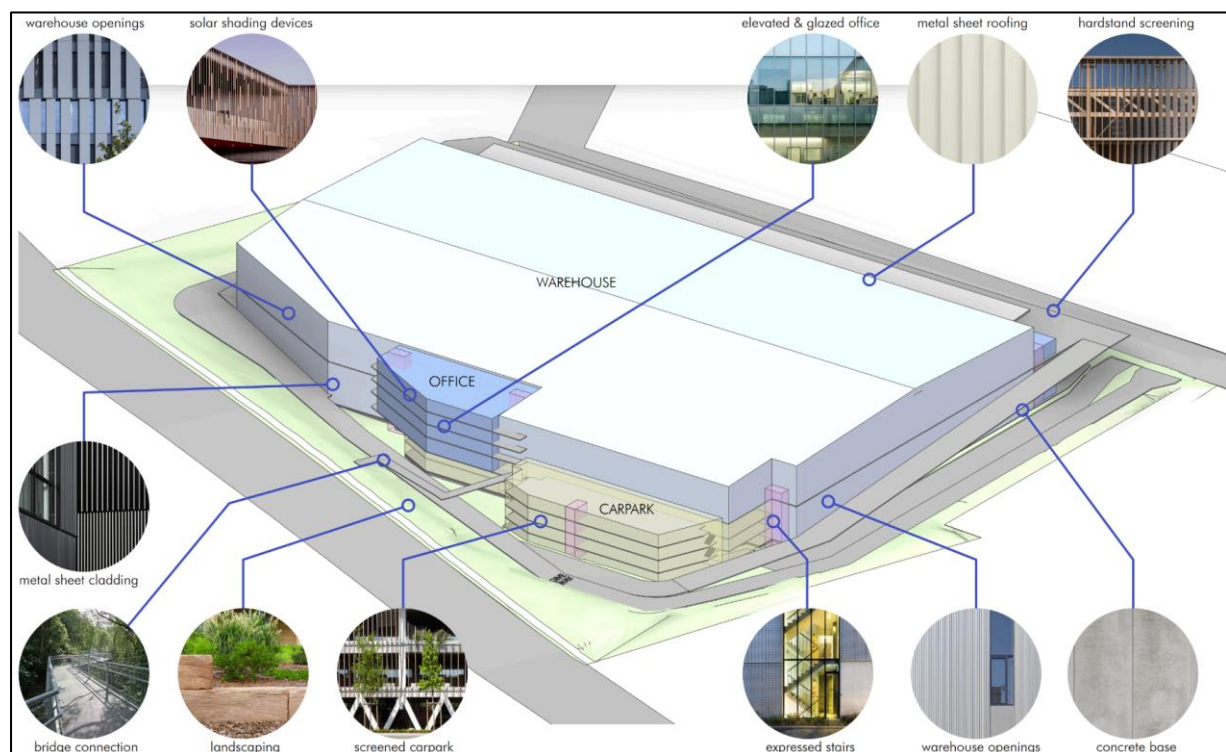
Architectural Application (Source: Nettletontribe Architects, 2024)
